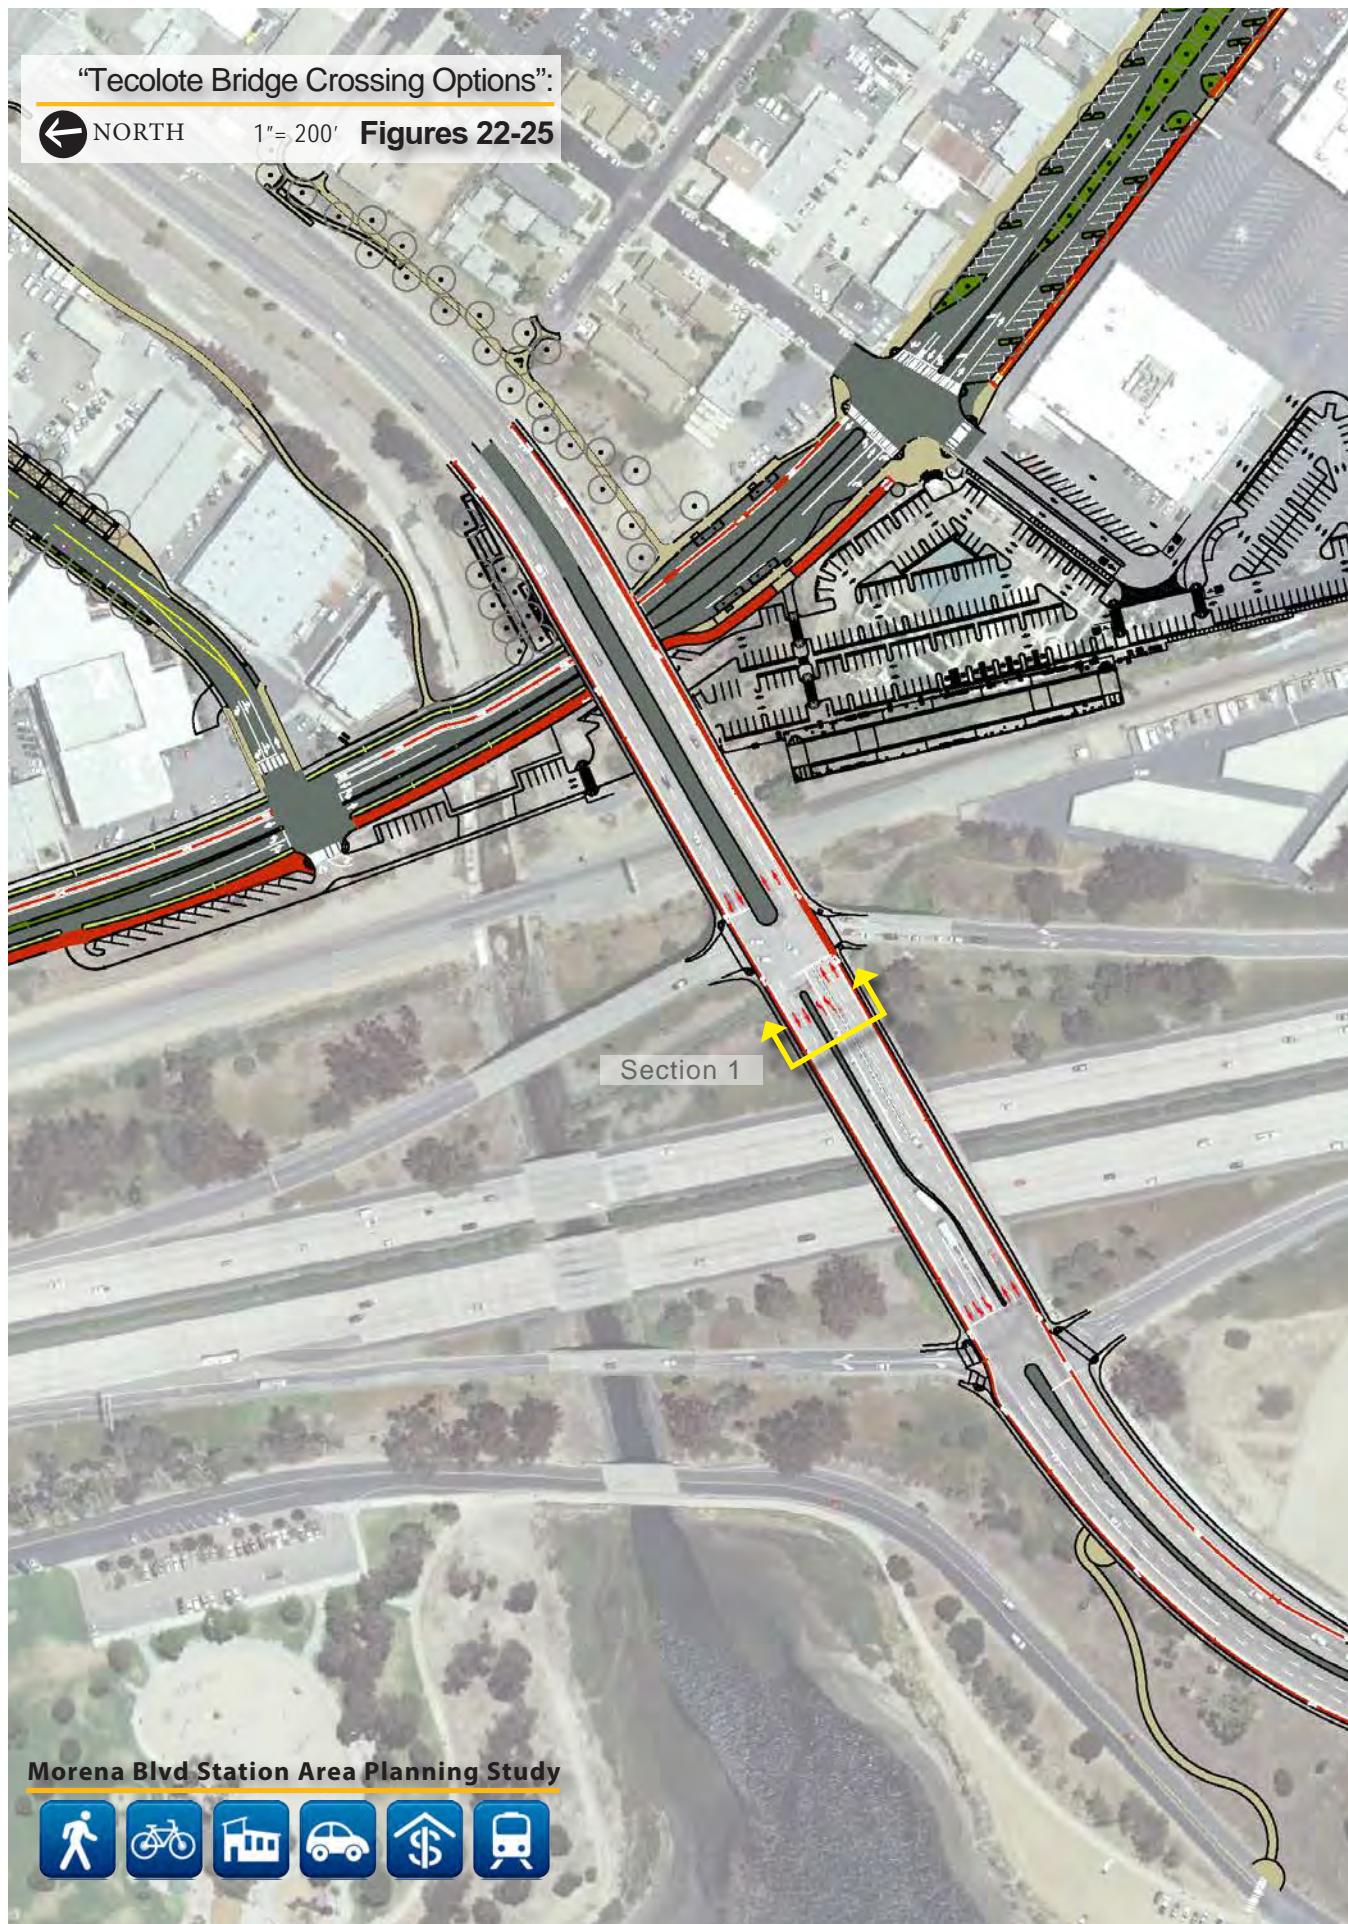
Plan View of Tecolote Bridge Crossing Improvements
